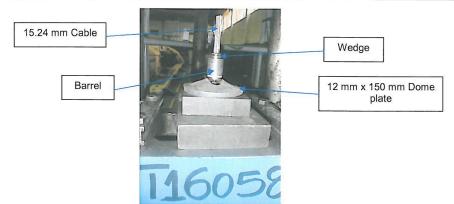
25 t Cable anchor assembly installed in the testing machine.
